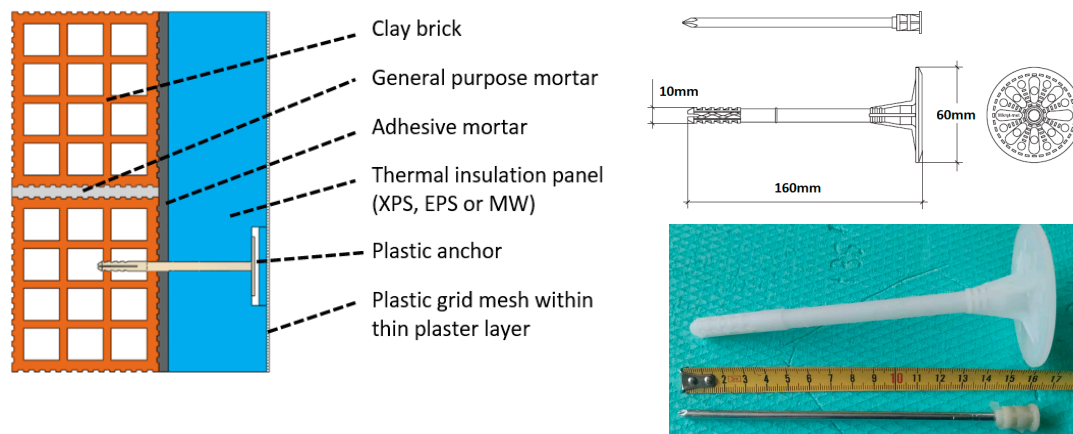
Typical cross-section of a thermal insulated infill wall with details of the used plastic anchor.
